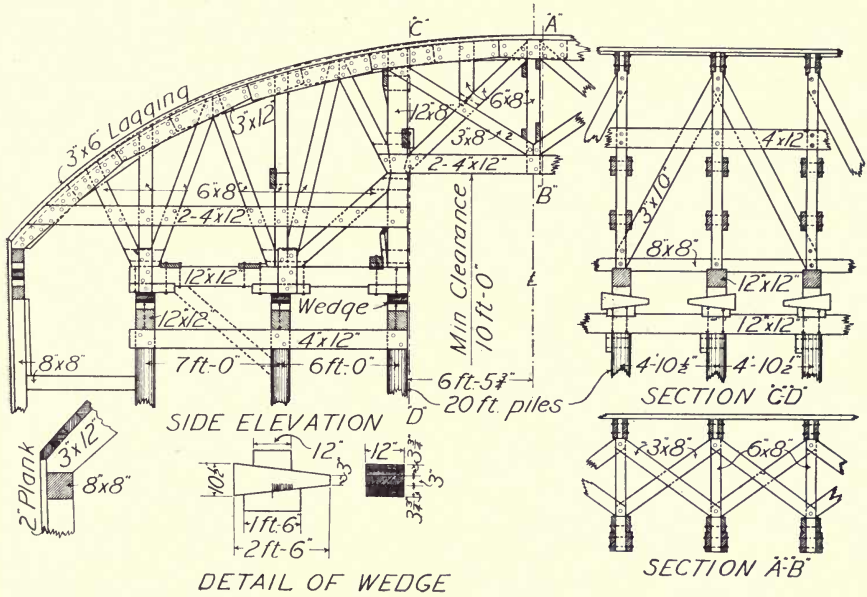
FORMS FOR JACKSON STREET ARCH.
